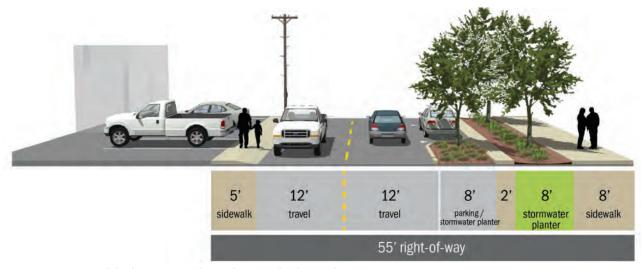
Conceptual Cross-Section for Stubb Street with continuous access (looking east)
